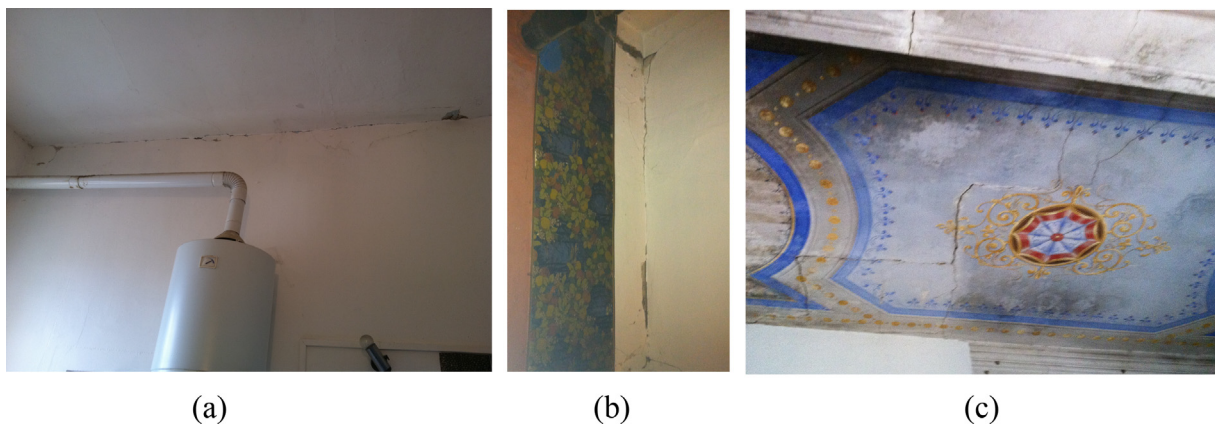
Cracks between floor and wall (a), between orthogonal walls (b) and in the ceiling (c).
